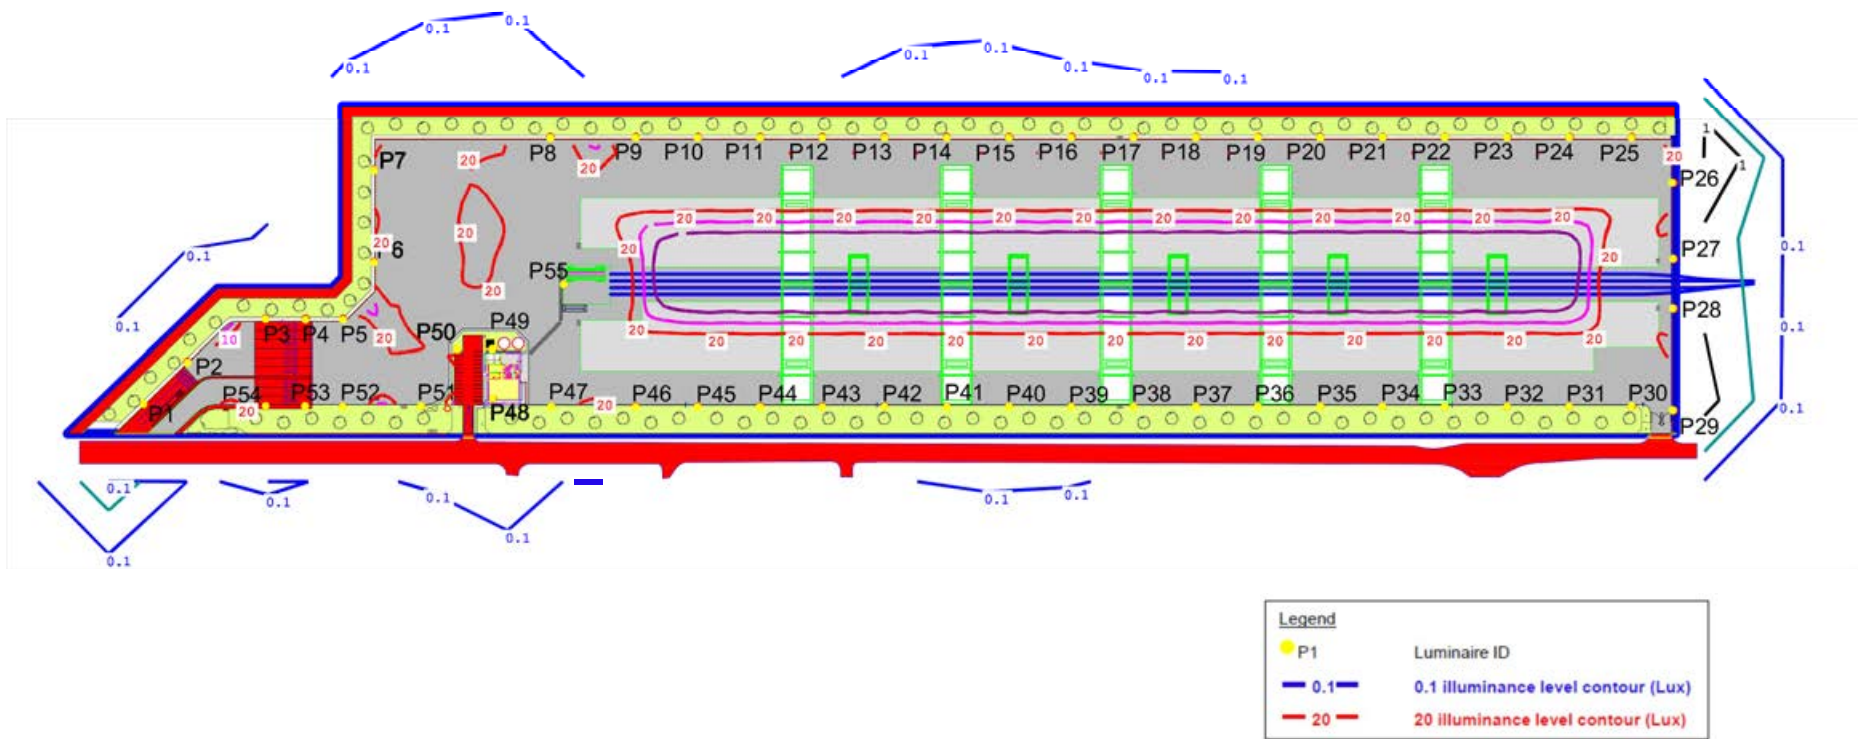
General site layout showing light spill isolux curves external to site as well as internal site lighting isolux curves from the static area site lighting design as noted above.
